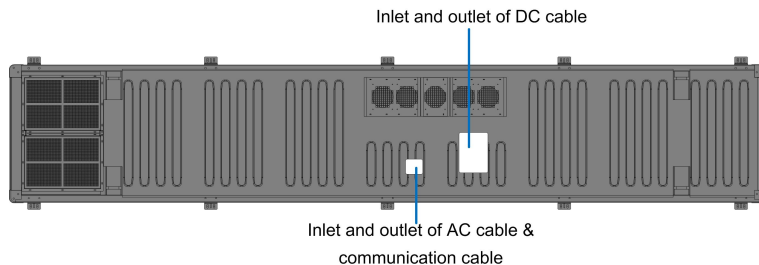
Schematic diagram of bottom cable inlet and outlet (top view)
